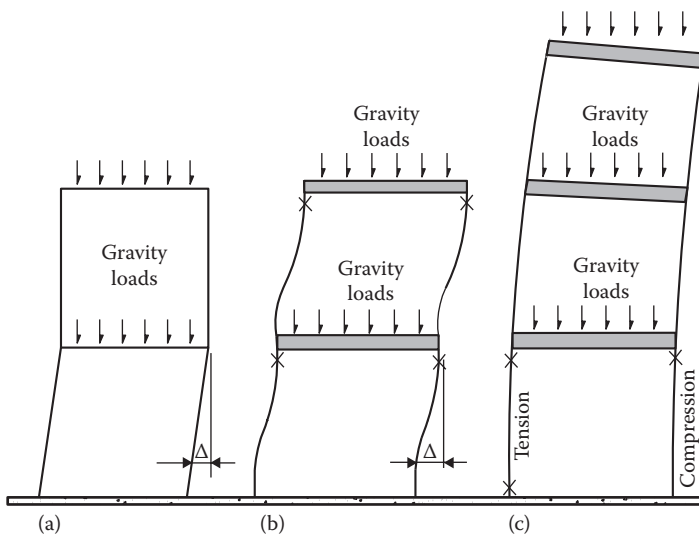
Collapse patterns: (a) inadequate shear strength, (b) inadequate beam/column strength, and (c) tension/compression failure due to overturning.
